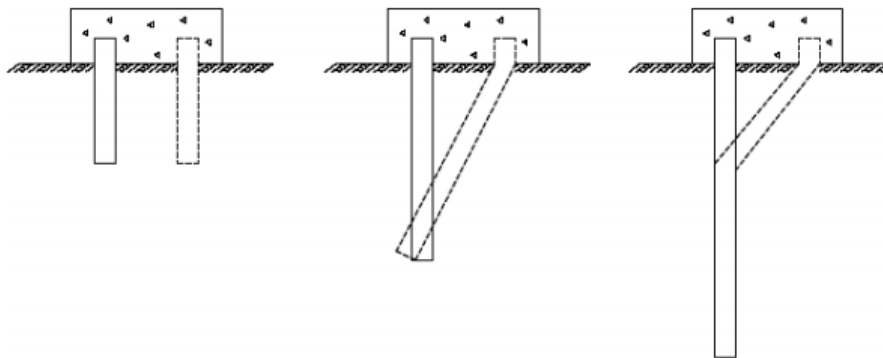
Failure modes for restrained piles through excessive deformation (left) and development of plastic hinges (centre and right), after [33].
